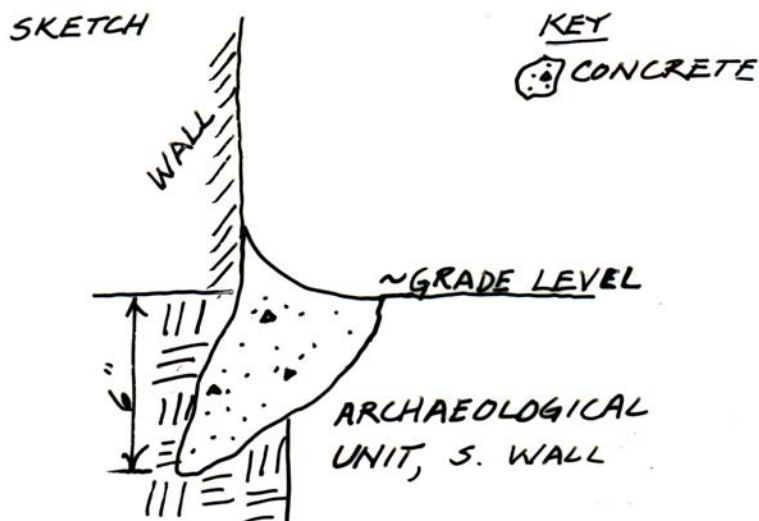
Elevation next to west cocina wall showing concrete apron.
